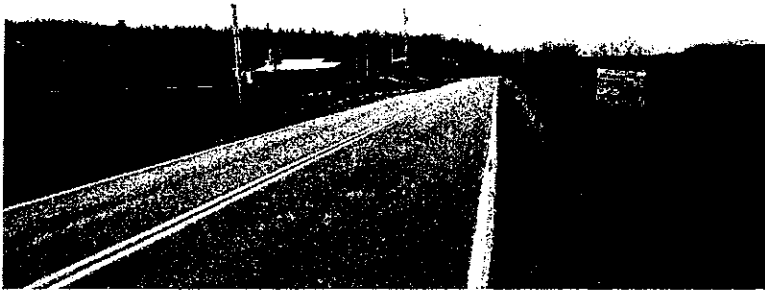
Looking south on Trunk 7 just north of Route 276.
